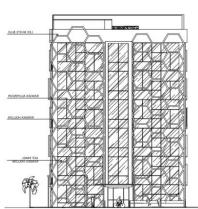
Front View of AK Laboratory Building Project name : Construction of AK Laboratory Buildings
